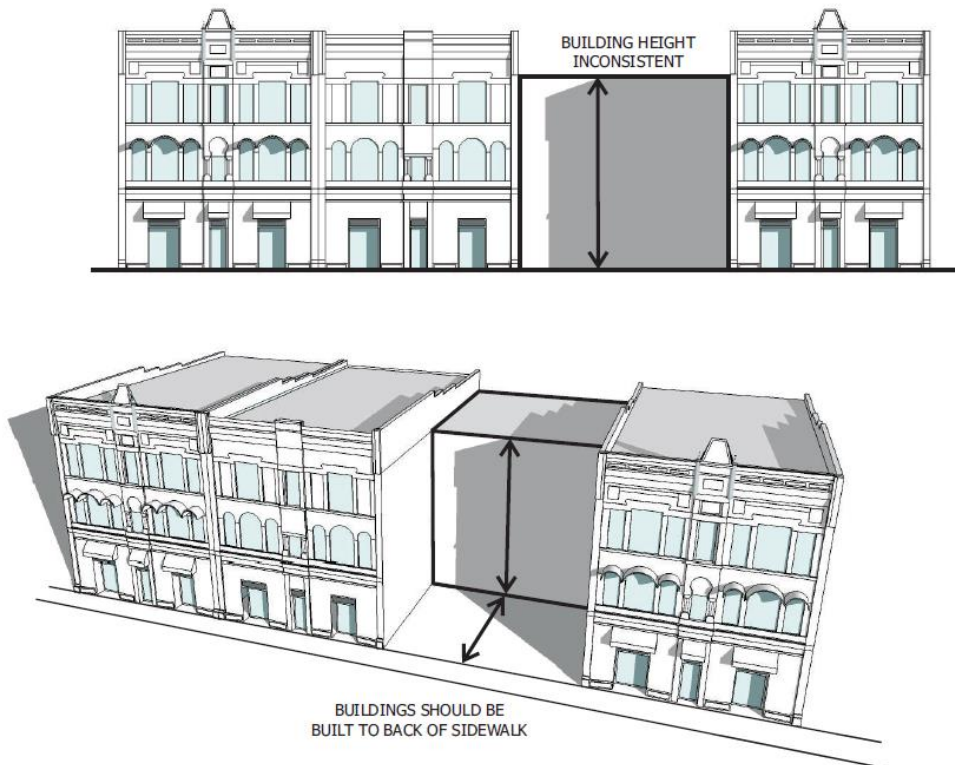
E: Buildings should be built to the back of the sidewalk. Buildings should not be setback behind the front facade of adjacent buildings unless creating a pedestrian amenity such as a courtyard or small urban plaza.
